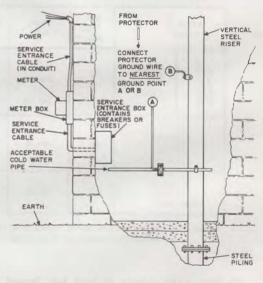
♦Acceptable Water System or Building Ground (Power Service Not Grounded)♦
